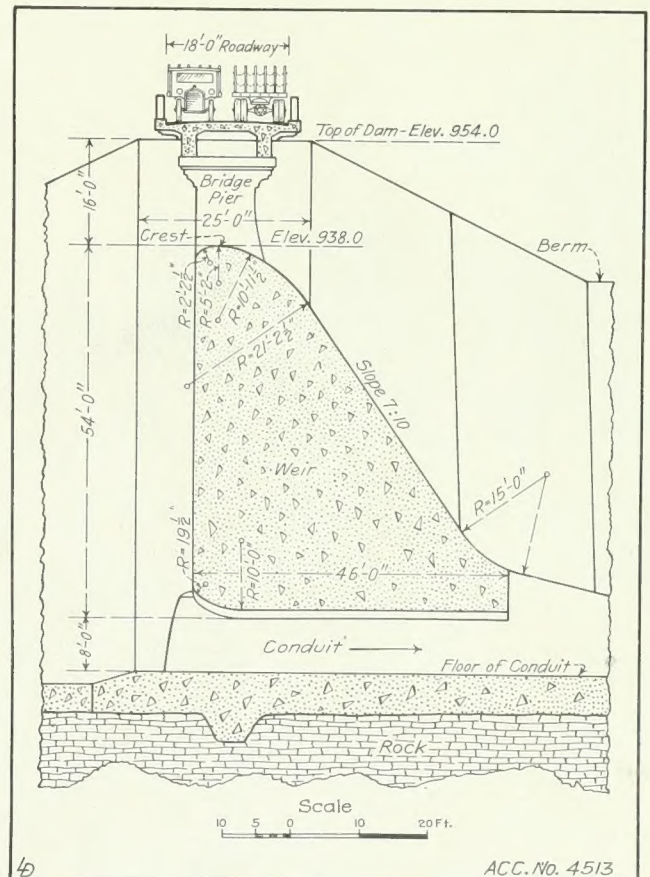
SECTION THROUGH WEIR AND BRIDGE.
